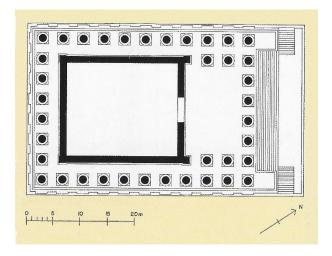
The floor plan of the Castor and Pollux temple. (Schollmeyer, 2008, p. 34.)
